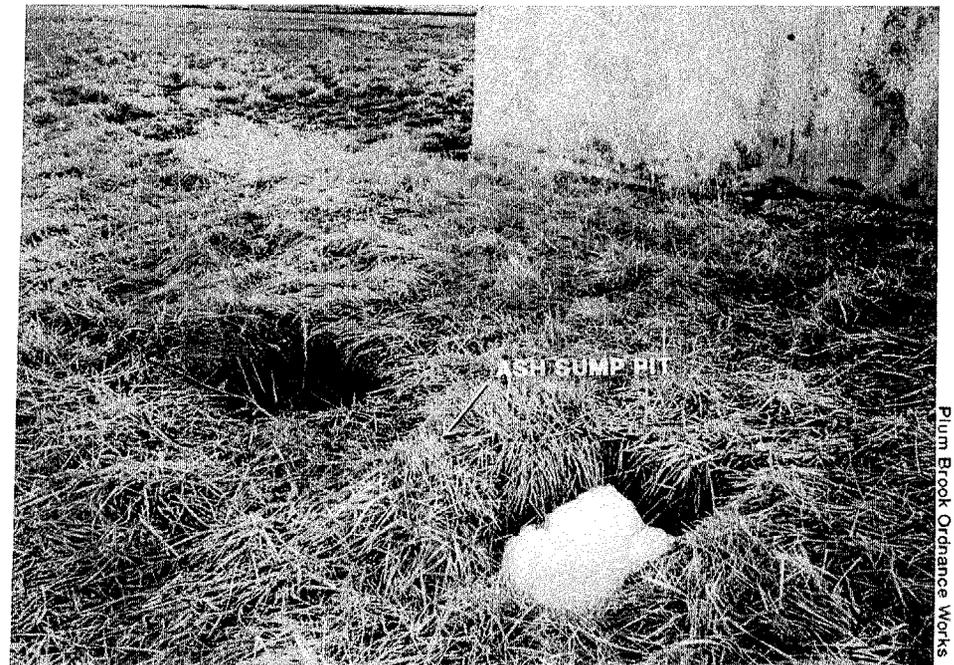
Ash sump pit located at northeast corner of Power Station #1 (photo taken in March 1995)
